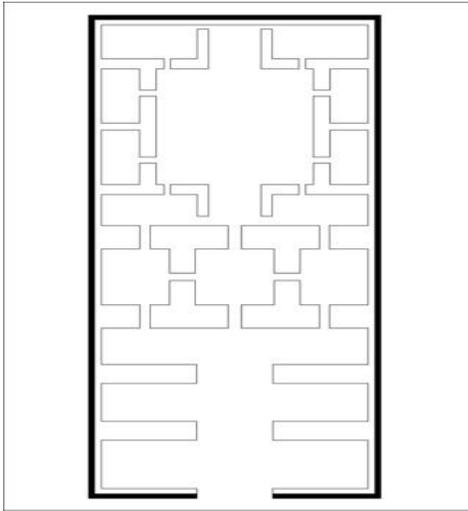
Firouzabad Fire Temple: Solid Walls Surround This Temple and Its Garden, Only One Opening Towards Outside
